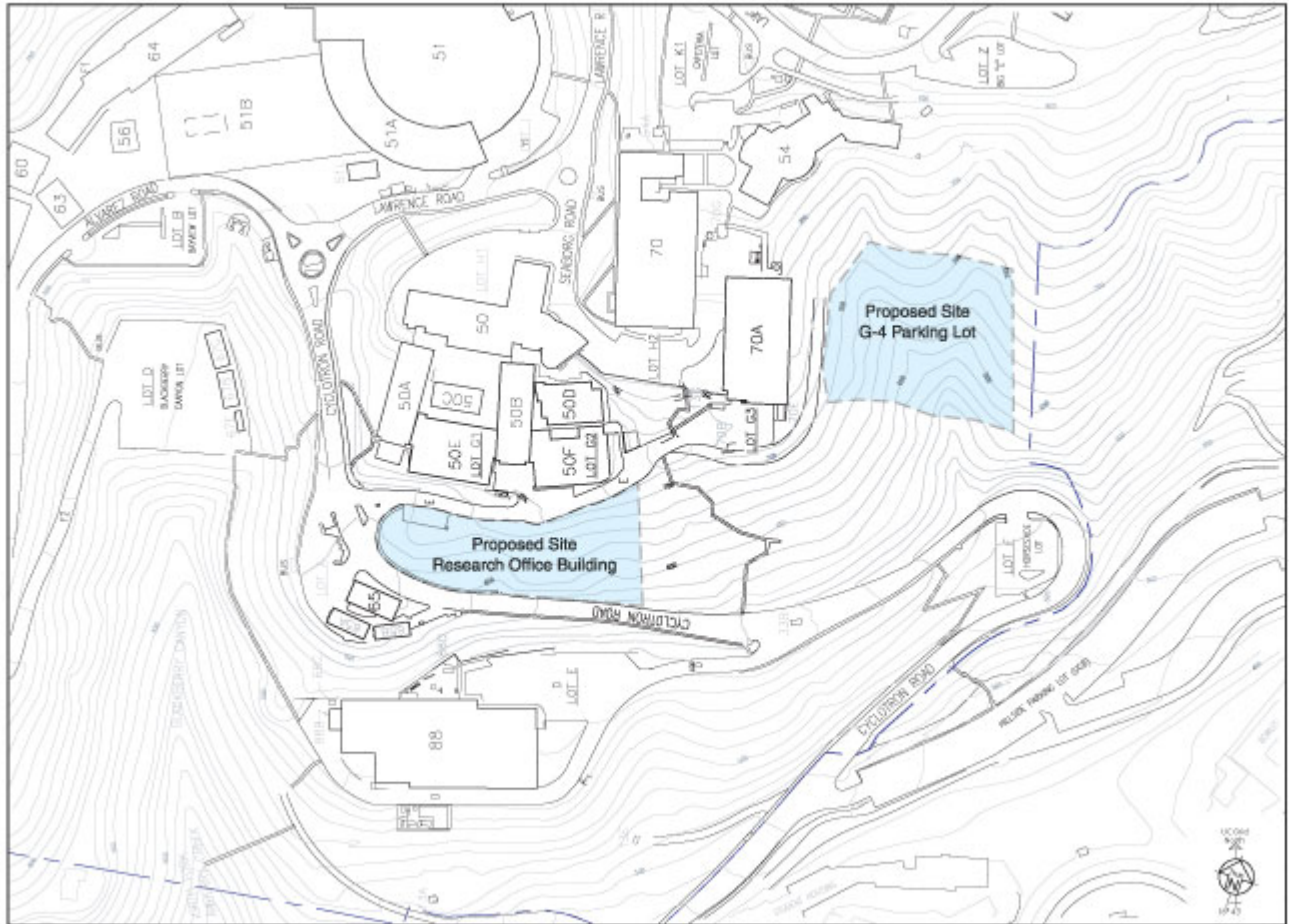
Building 49 and G-4 Parking Lot Site Locations
